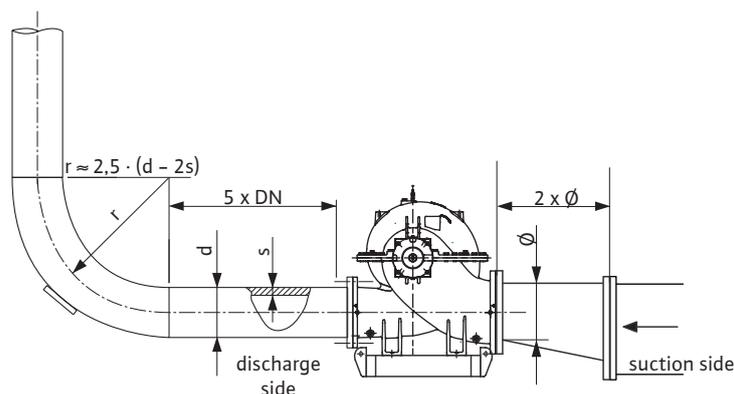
Connecting the pump without tension, settling section upstream and downstream of the pump
